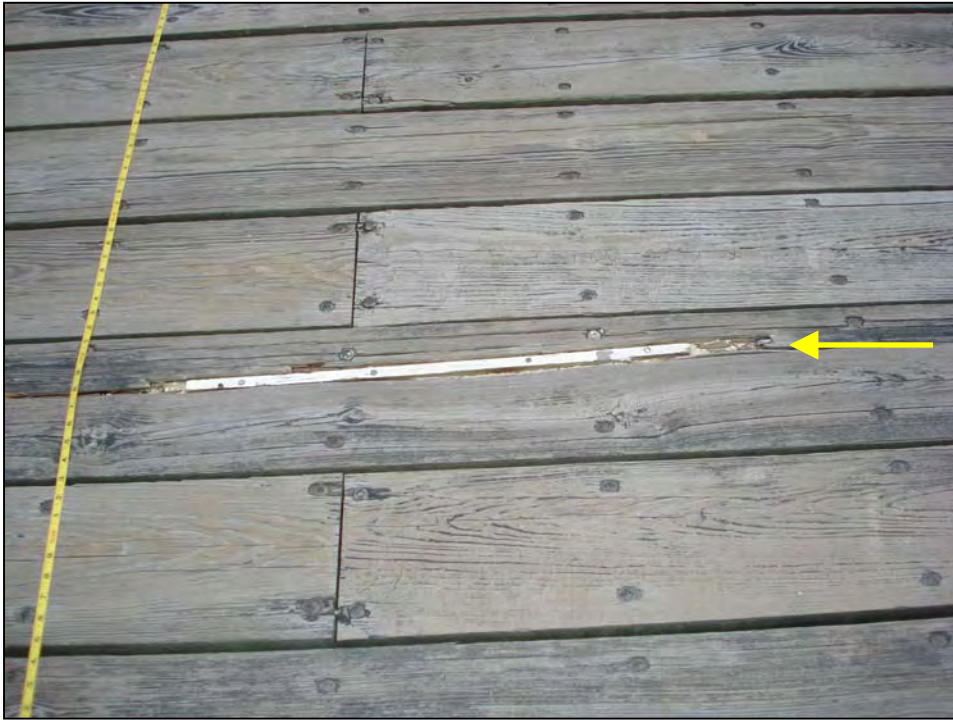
Rotted timber deck with filler piece at Station 1+60.
